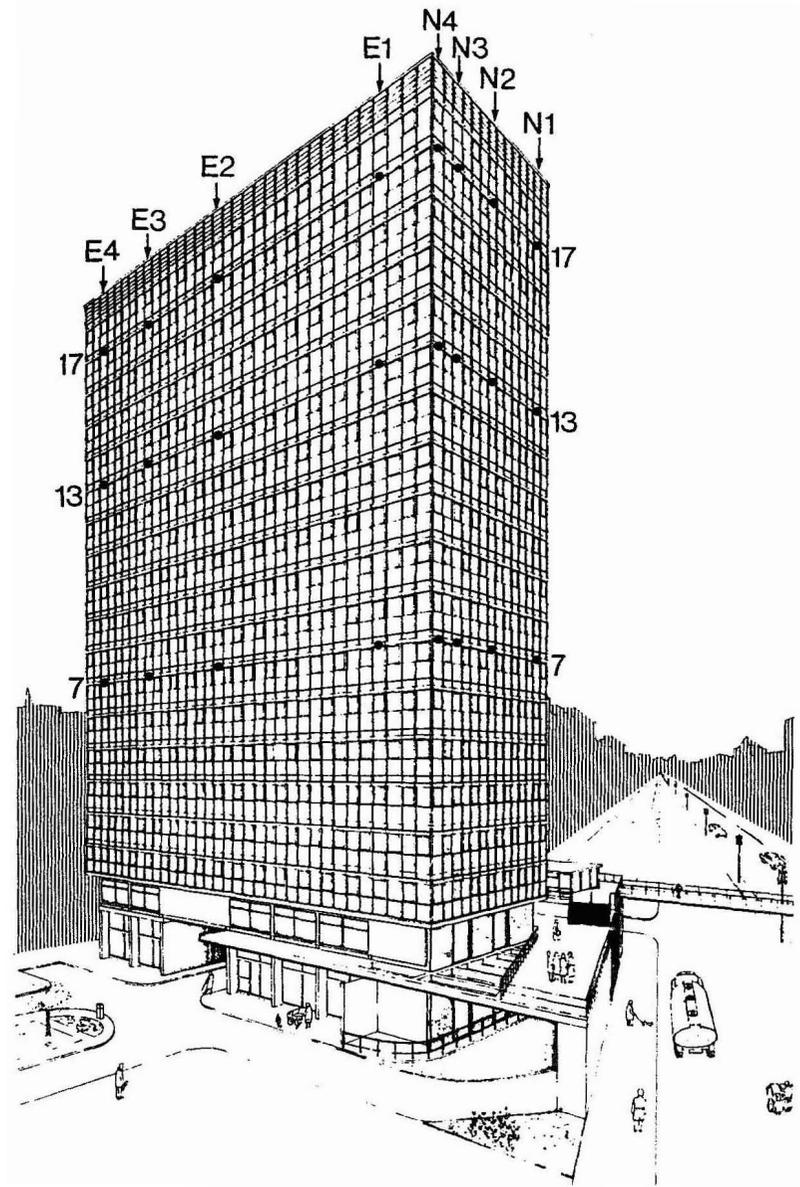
Arrangement of wind-pressure transducers on the face of Royex House
